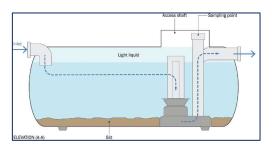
Typical Section Detail of Fuel Separator (CIRIA C753)
